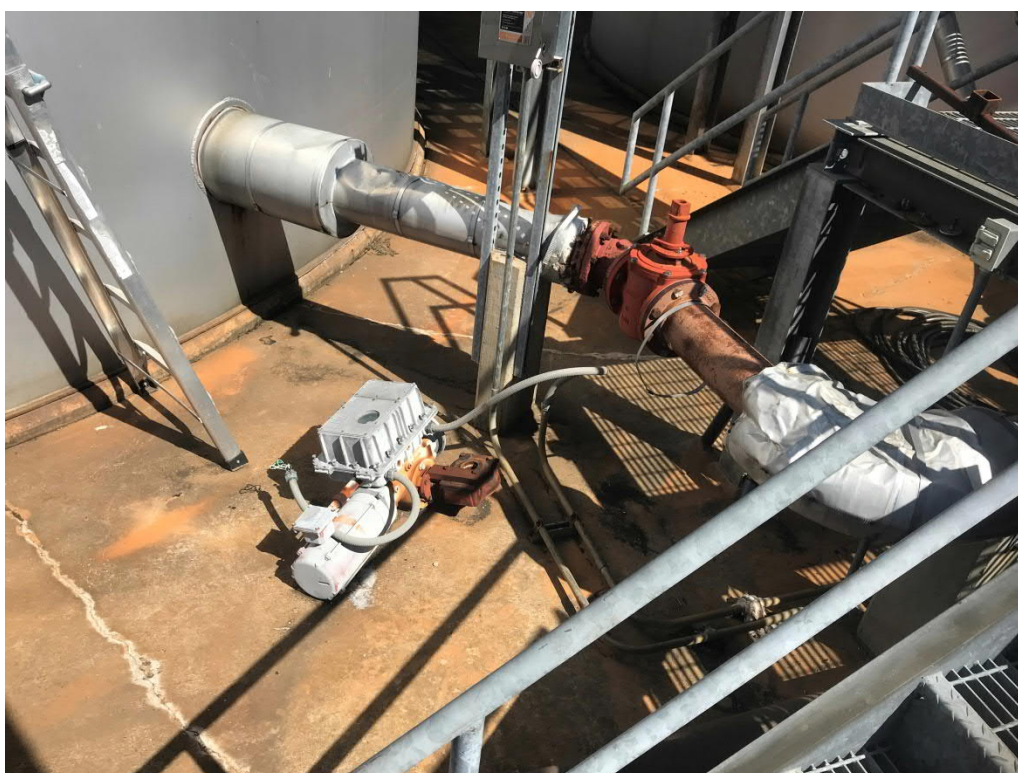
Chrome Finished Tanks non-working motor actuated valve
